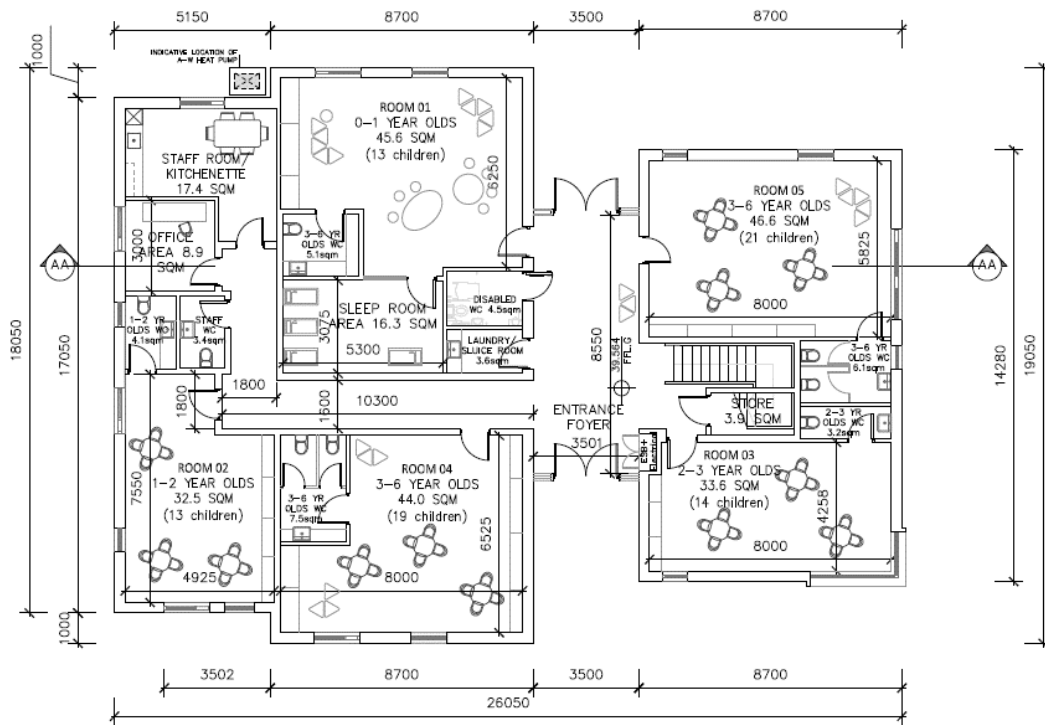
Ground floor of the Proposed Crèche (Darmody Architects).
